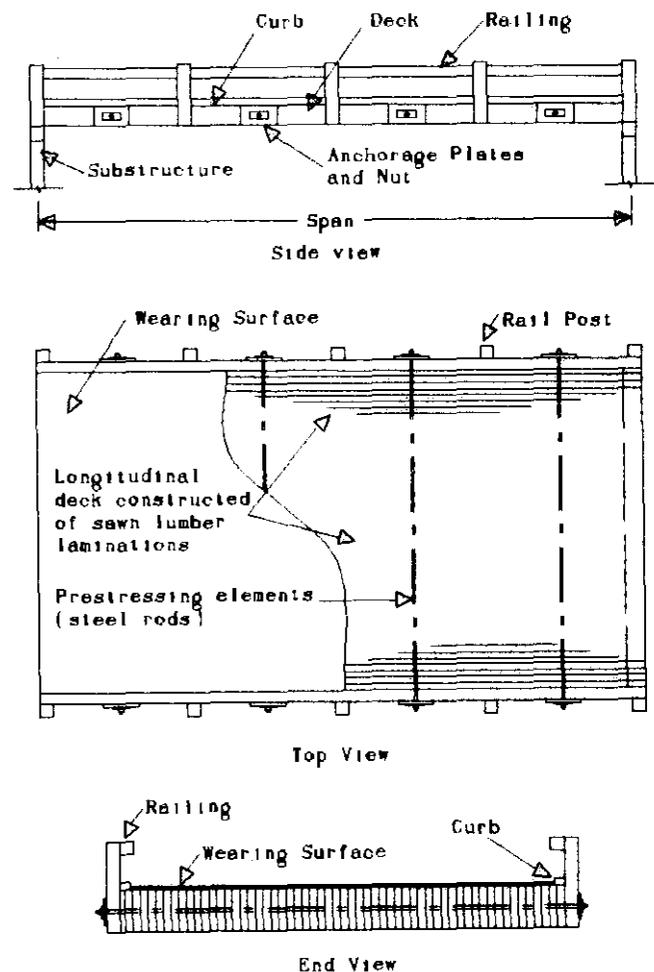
Typical configuration, for a longitudinal stress-laminated lumber deck bridge.
